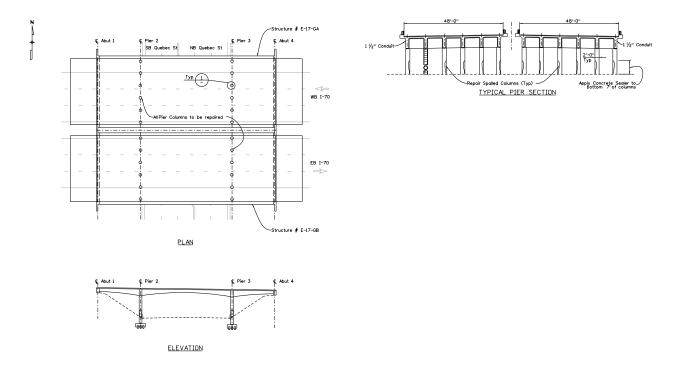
(D)-1 Sample General Layout for a Pier Cap/Column Repair
